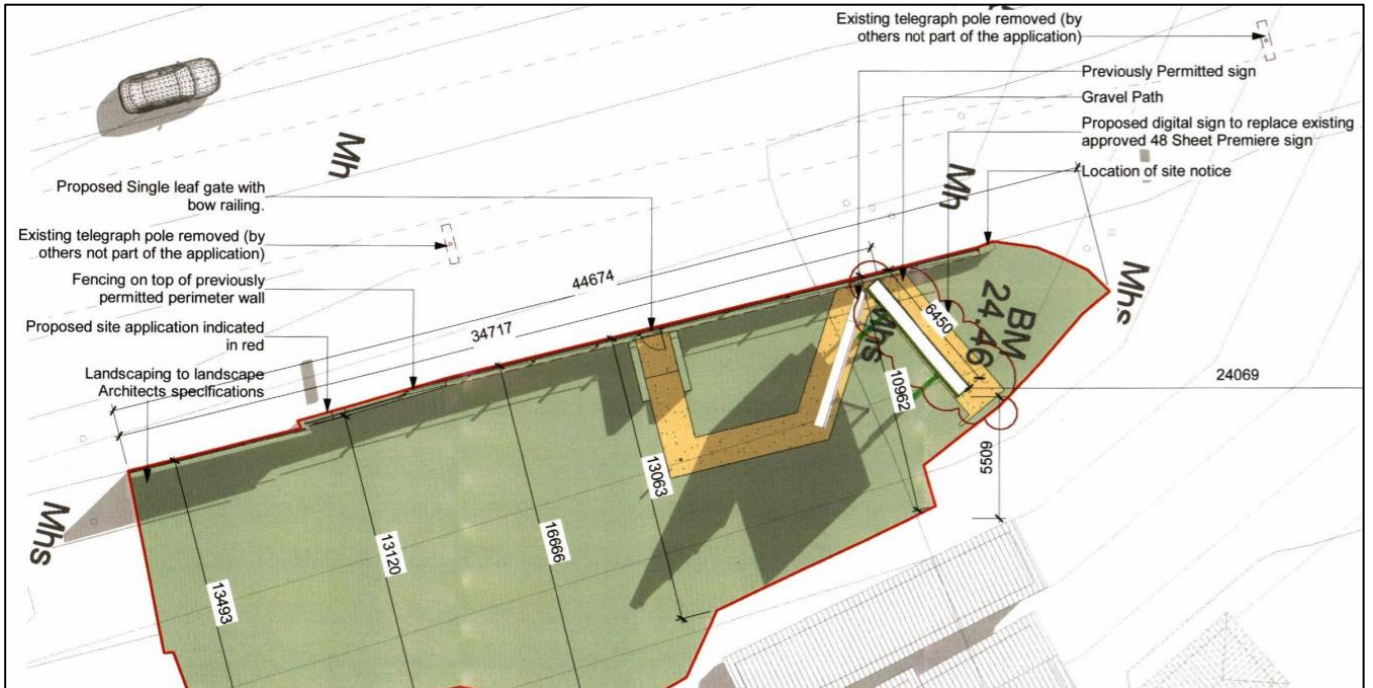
Proposed Replacement Sign and Railing Site Layout Plan, Loughlinstown © Dun Laoghaire-Rathdown County Council 2020
